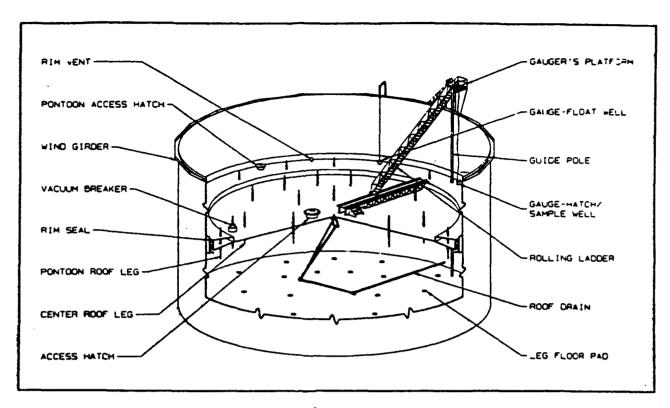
EXTERNAL FLOATING ROOF TANK (PONTOON TYPE)
